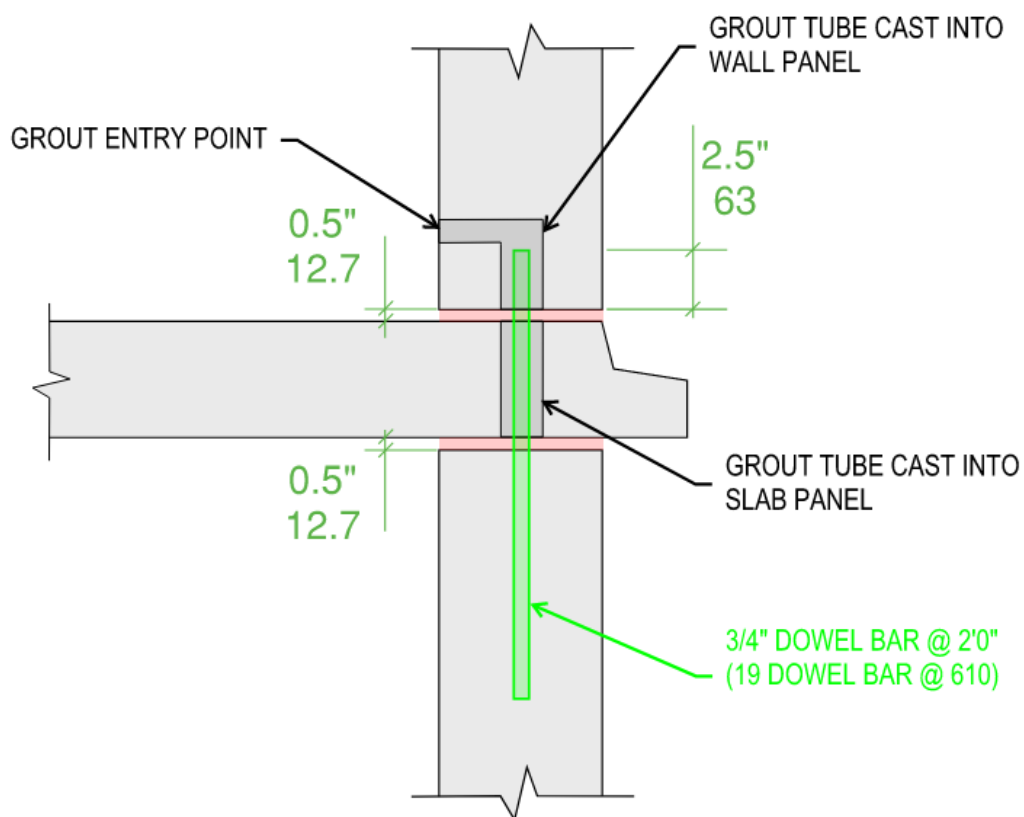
Typical load-bearing wall panel to slab panel connection (with dowel continuing into panel above). This detail occurs at some select wall panel locations within the building.
